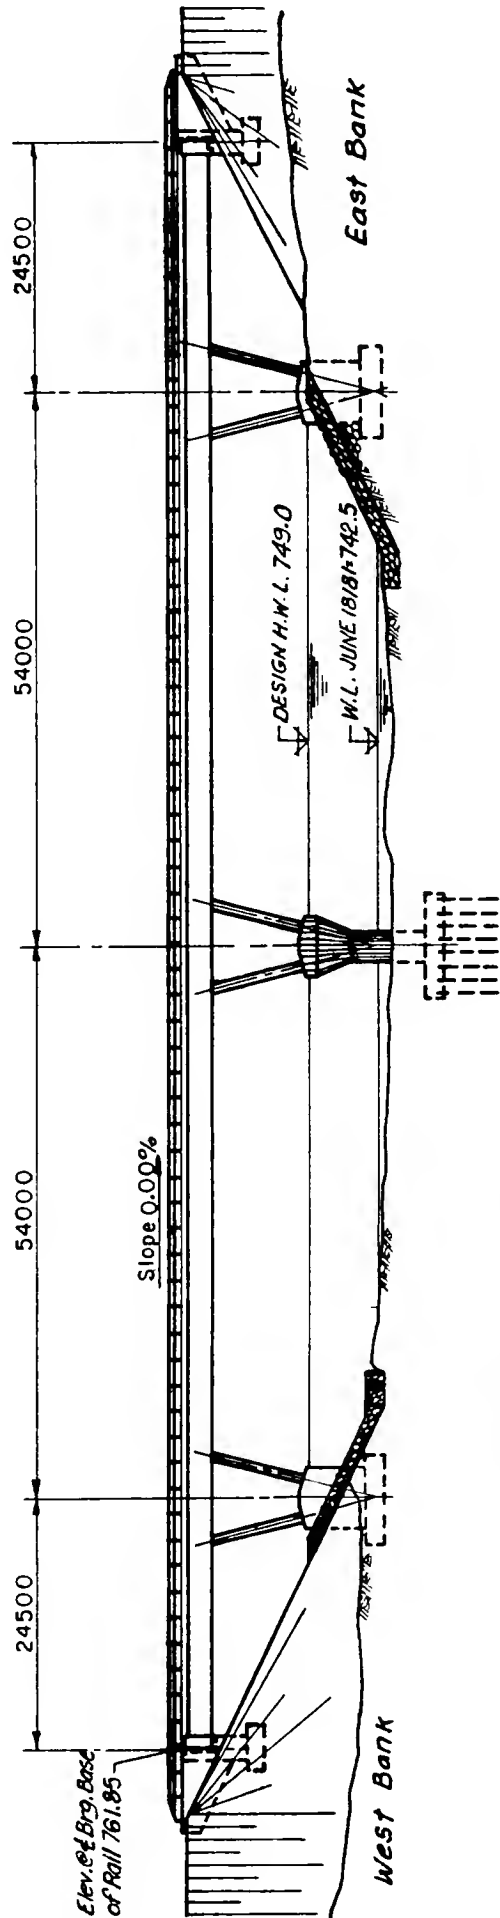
ELEVATION - MURRAY RIVER BRIDGE
